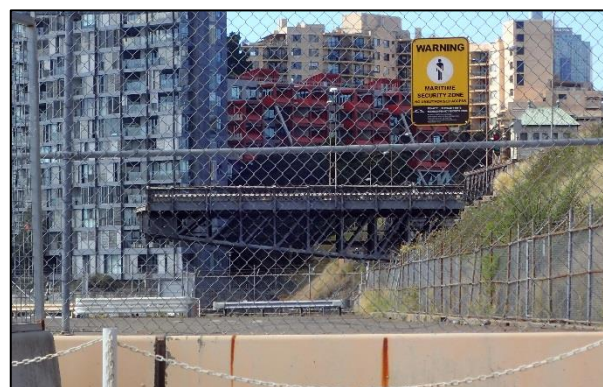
View of Glebe Island Bridge from Rozelle, facing east
